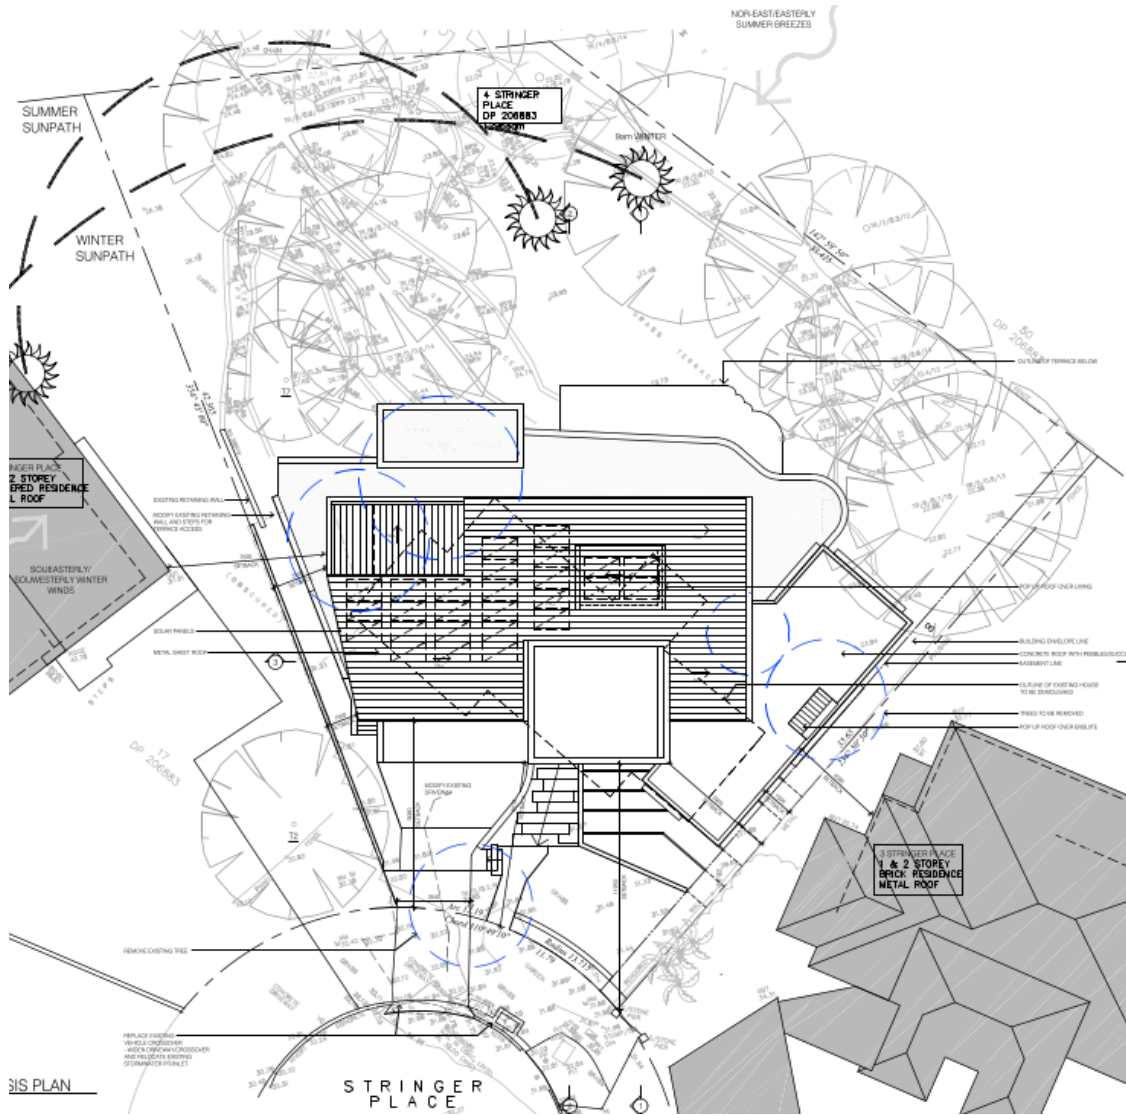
Site Plan (Extracted from submitted plans prepared by Group Architects).
